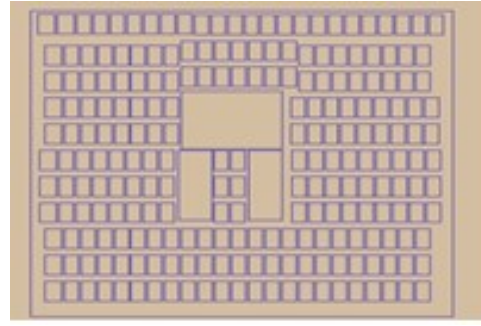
System arrangement of solar panels on the roof top by AutoCAD design.
